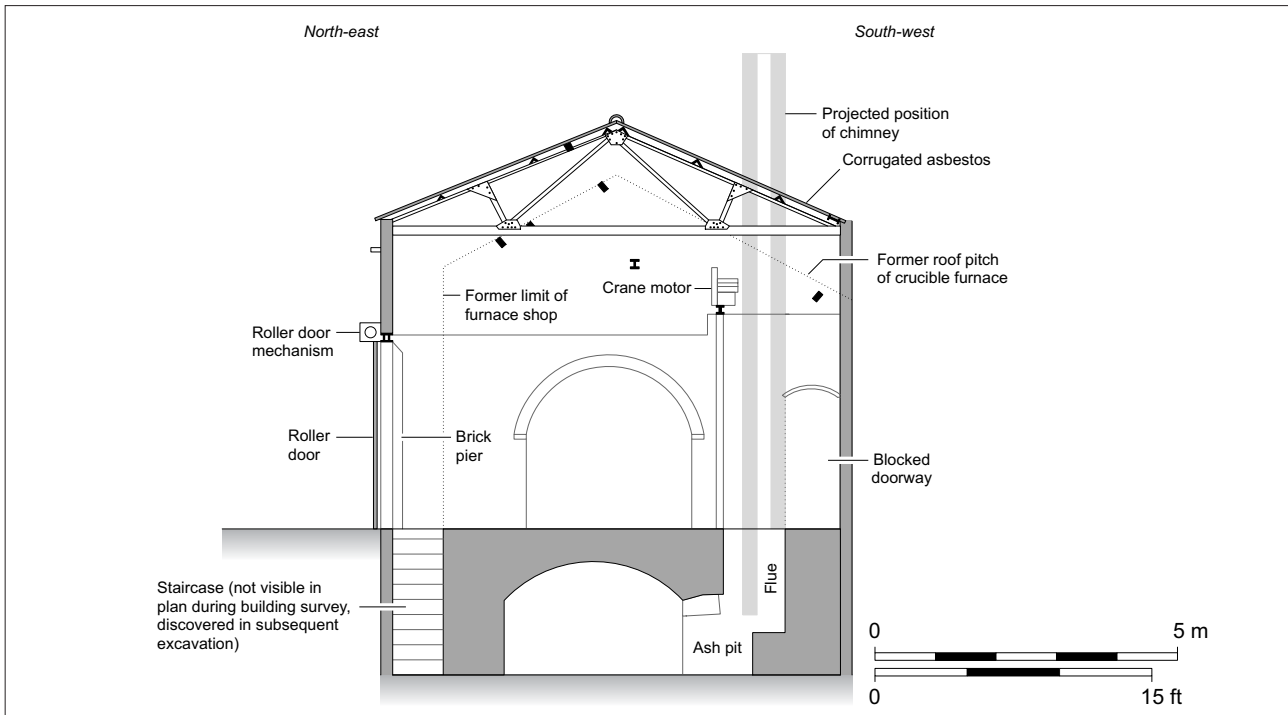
Malinda Works, south-west facing cross-section of building E4, cellar and room G13
